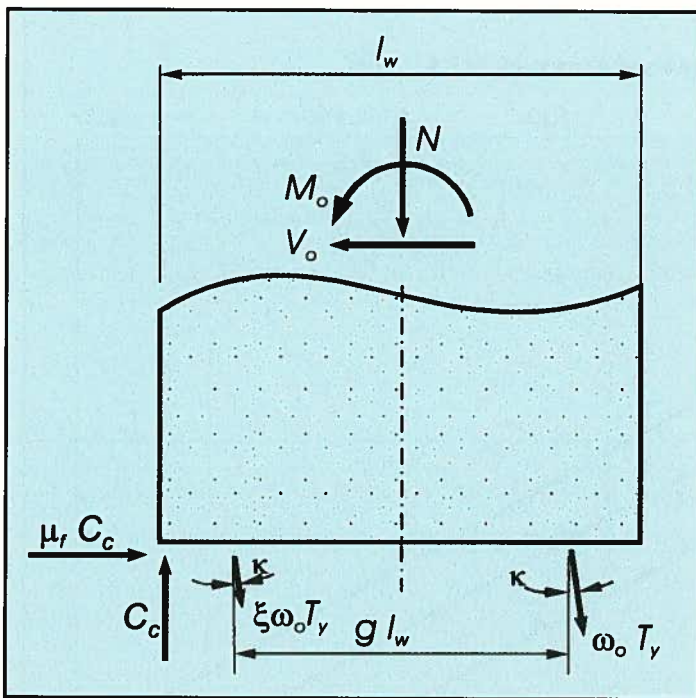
Shear resisting mechanisms at joint between a wall panel and foundation.
